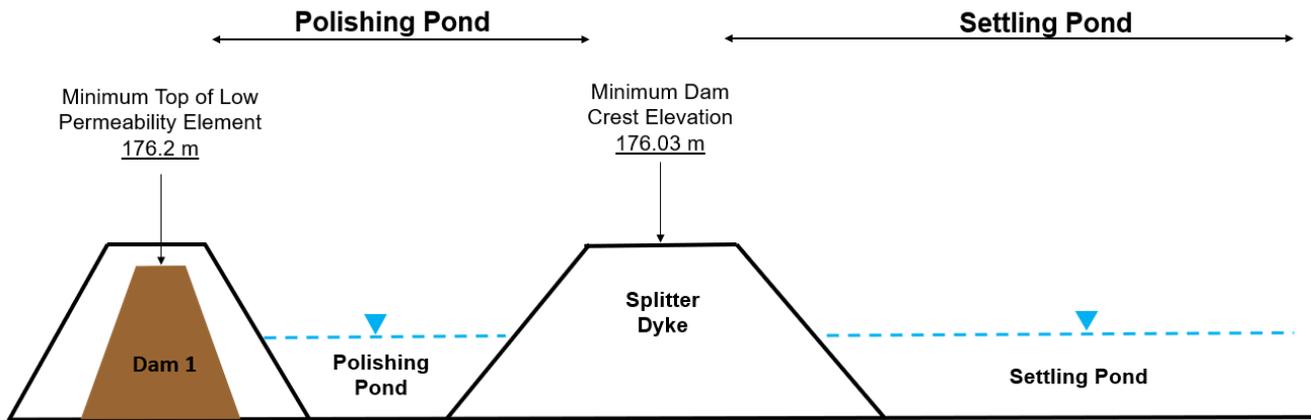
Water and Infrastructure Elevations for Settling Pond / Splitter Dyke (not to scale)
